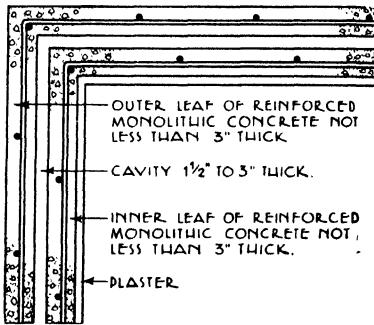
CAVITY WALL HAVING TWO LEAVES OF REINFORCED MONOLITHIC CONCRETE
